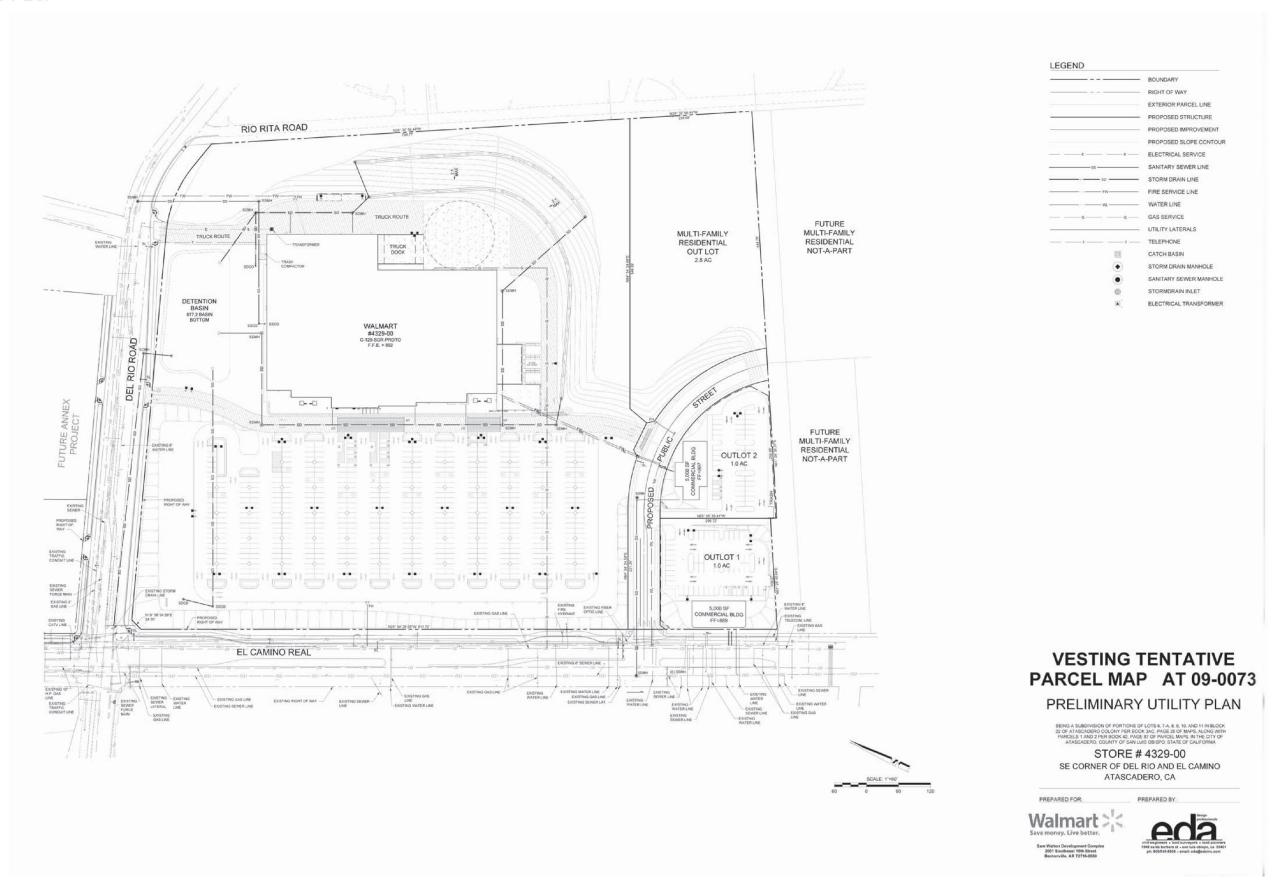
ANNEX PROJECT SITE PRELIMINARY UTILITY PLAN
